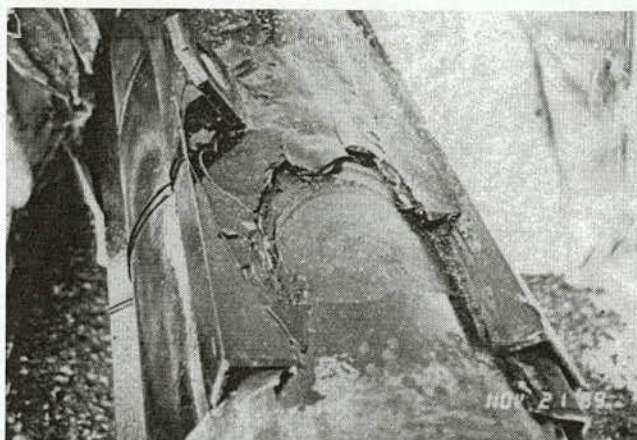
Bitumen cracking because of rapid cooling. (Note the concoidal fracture faces indicating an amorphous material.)
